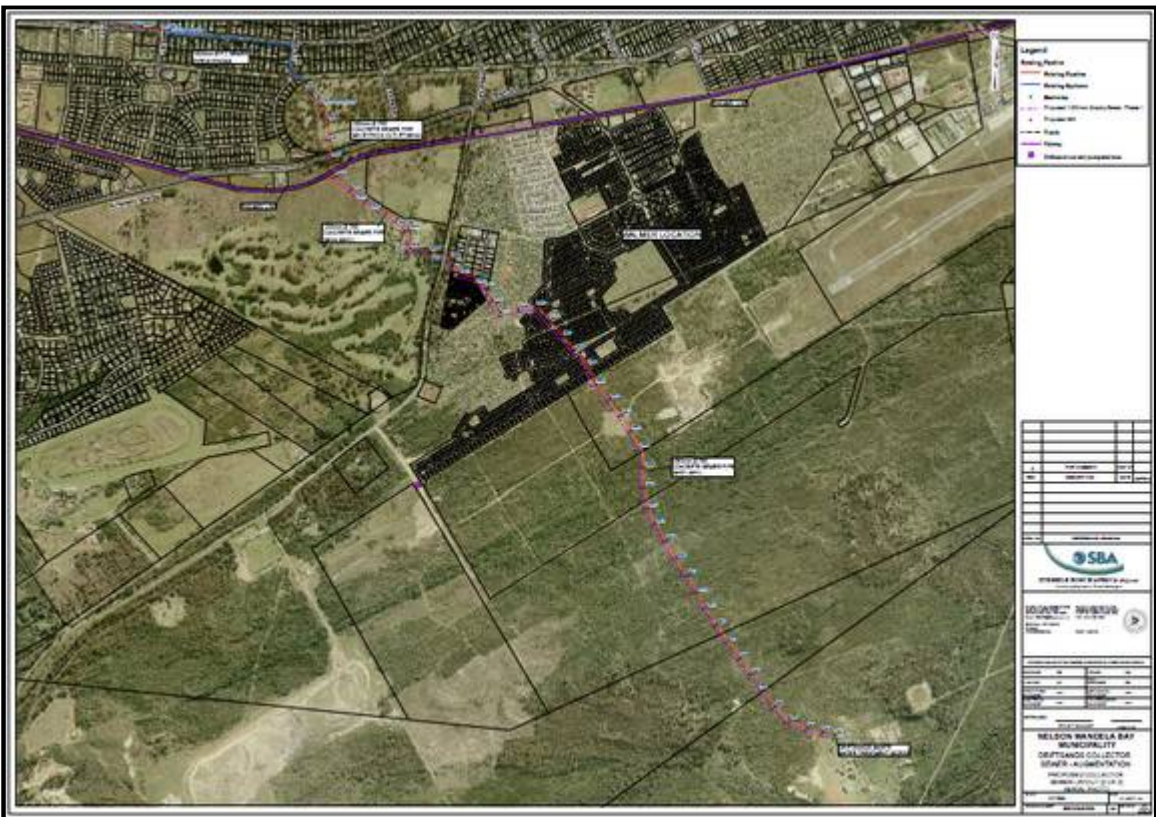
Driftsands Collector Sewer Augmentation, Walmer, Port Elizabeth
